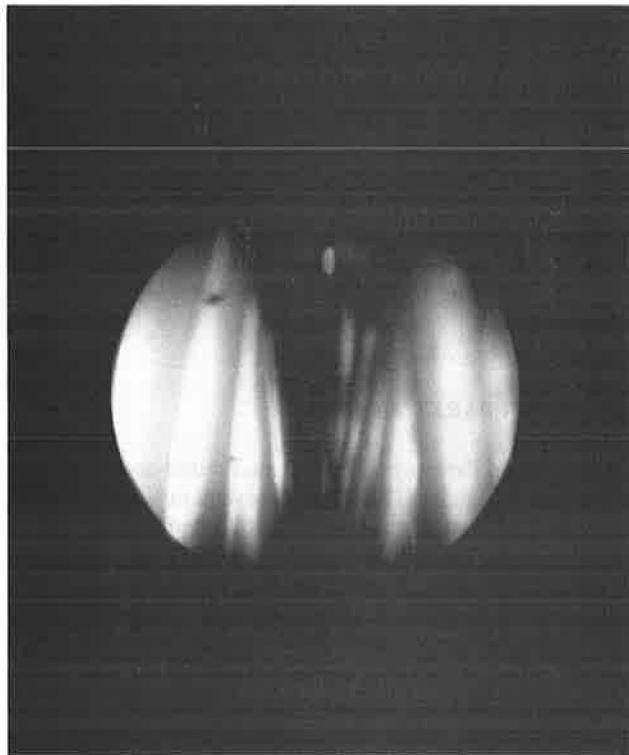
Signs of horizontal compression in core of Type-D edge drain.
